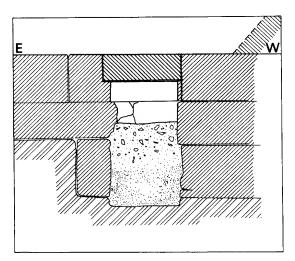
Southeast secondary foundation deposit, section. Scale 1:40. See pl. 63c.
